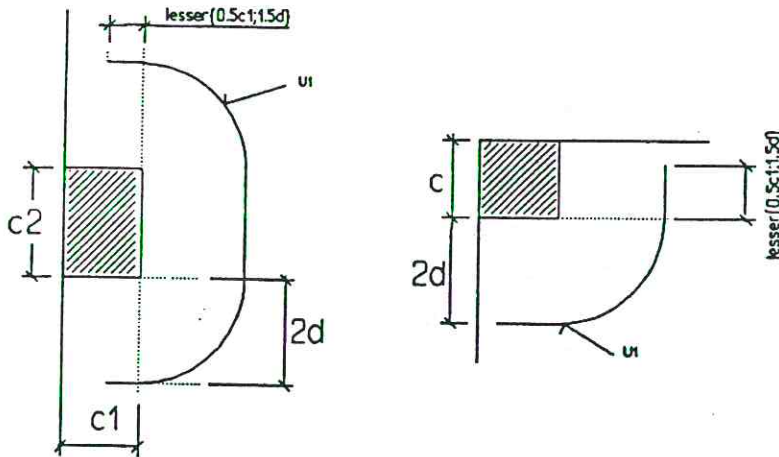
Critical perimeter u_1 at edge and corner column
